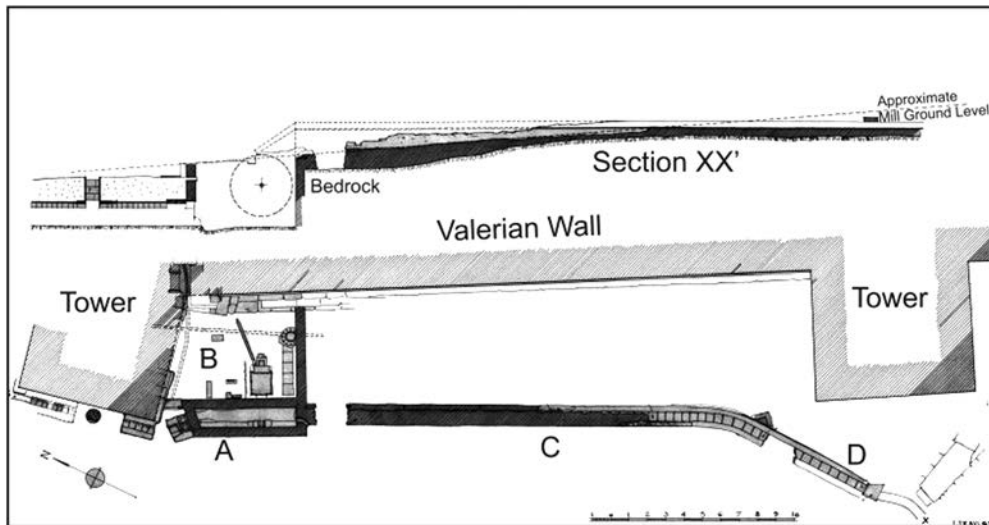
Plan and section of the central watermill (Parsons, 1936)
